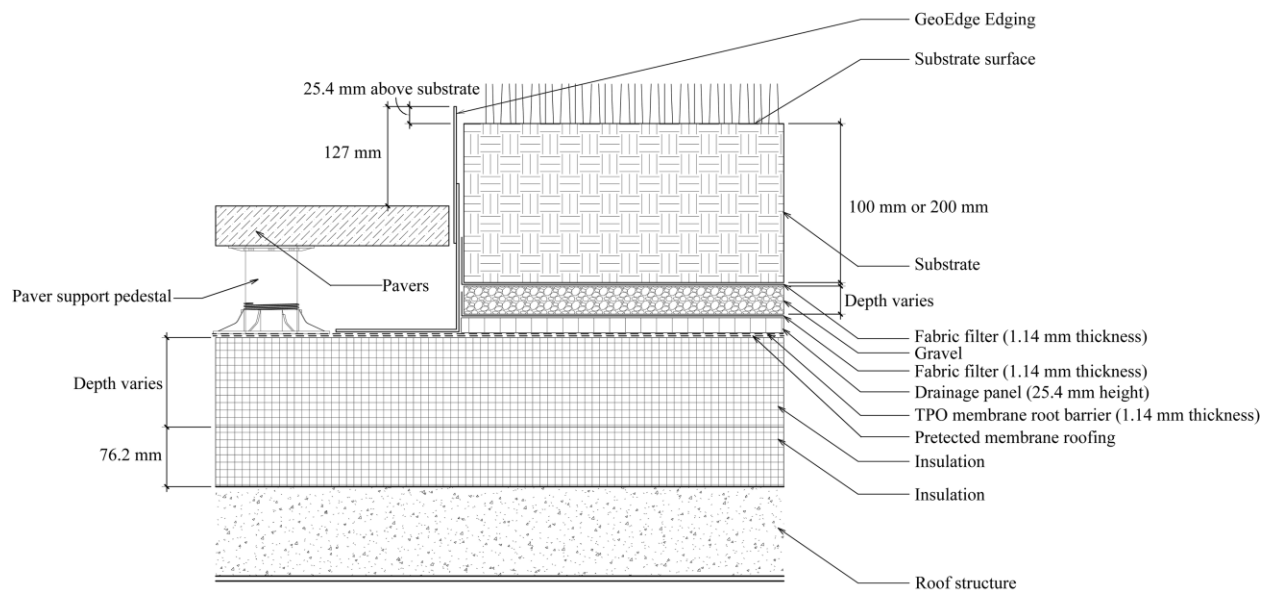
Cross Section of the APD Experimental Green Roof atop the new (2017) Architecture, Planning and Design Building at Kansas State University. (Source: KSU Seaton Hall and Seaton Court Renovation and Expansion Construction Documents. Adapted by Priyasha Shrestha).
